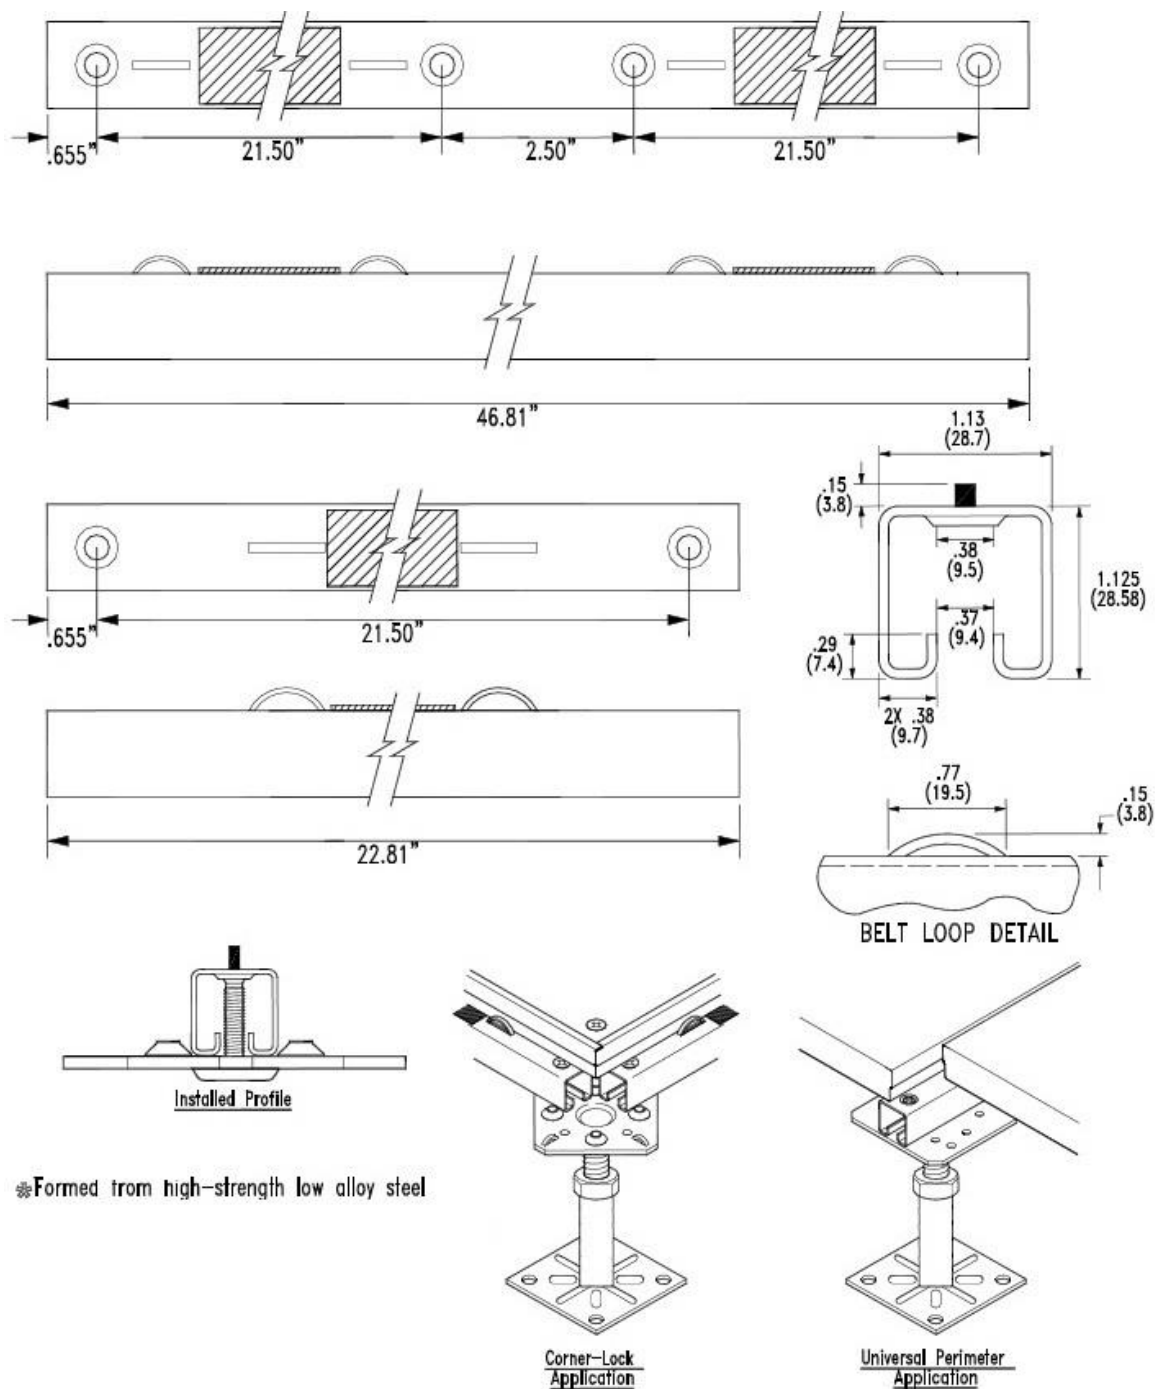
Heavy Duty Stringer Profile and Dimensions
